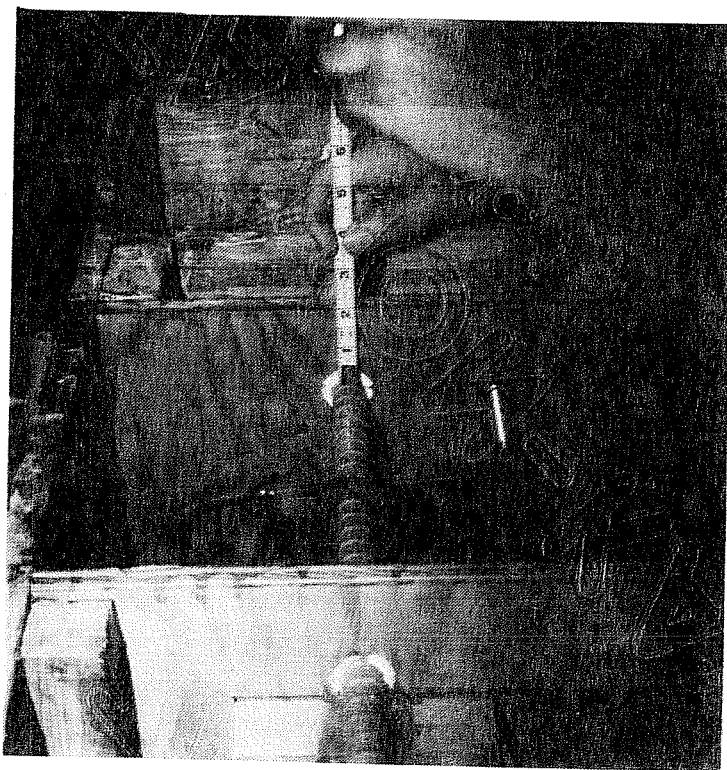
Concrete cast in a Type A pullout specimen formwork unit.
